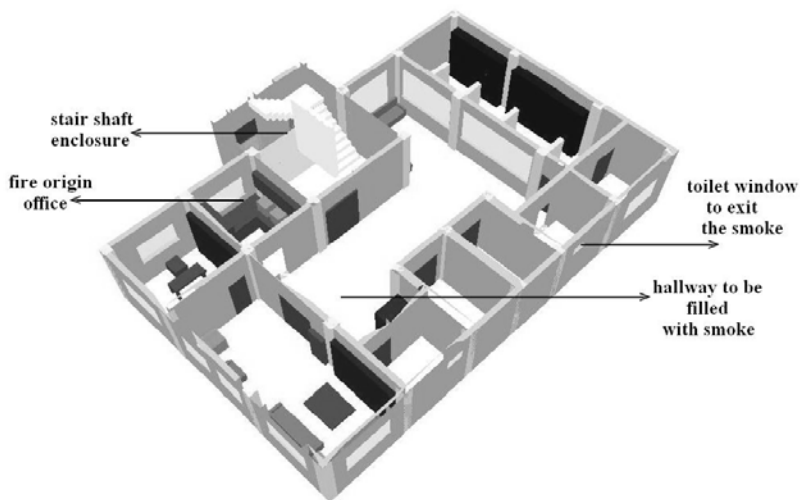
The building subject of the fire modeling. Plan of the first floor (in section)
